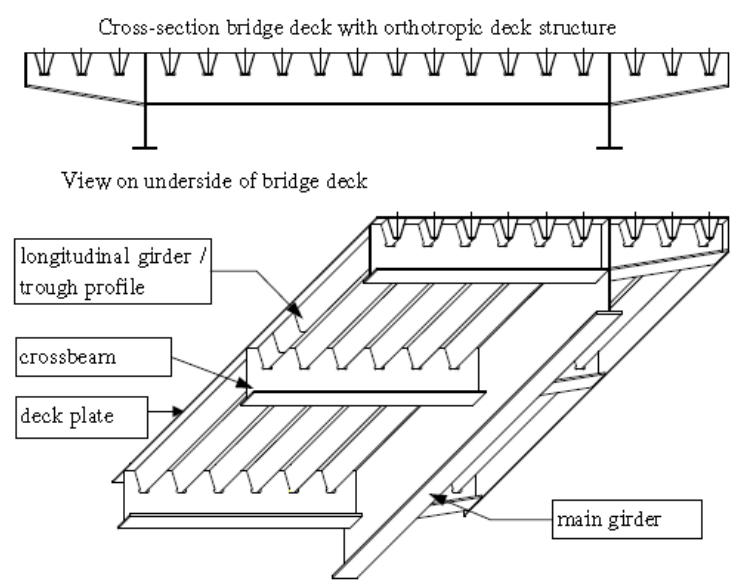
Typical layout of a steel bridge (de Jong, F.B.P.)
